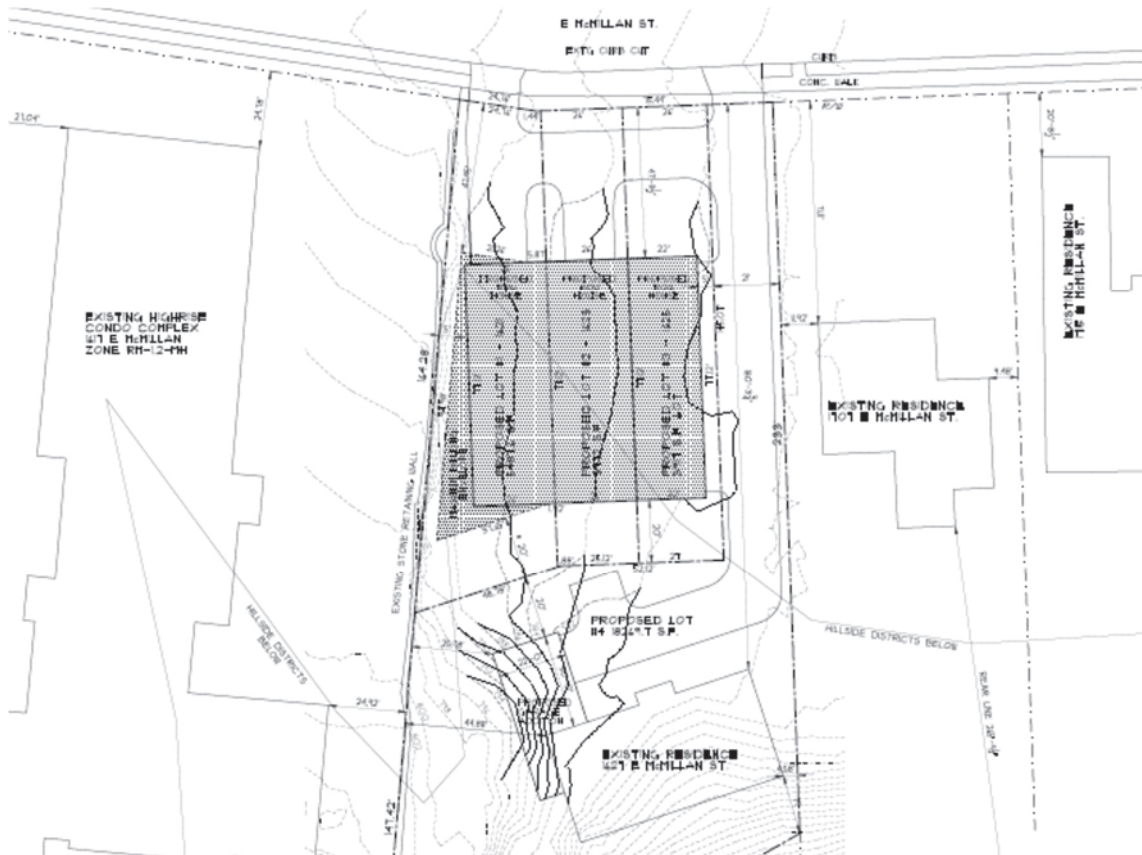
Proposed townhomes and garage addition site/grading plan at 1627 E. McMillan St.
